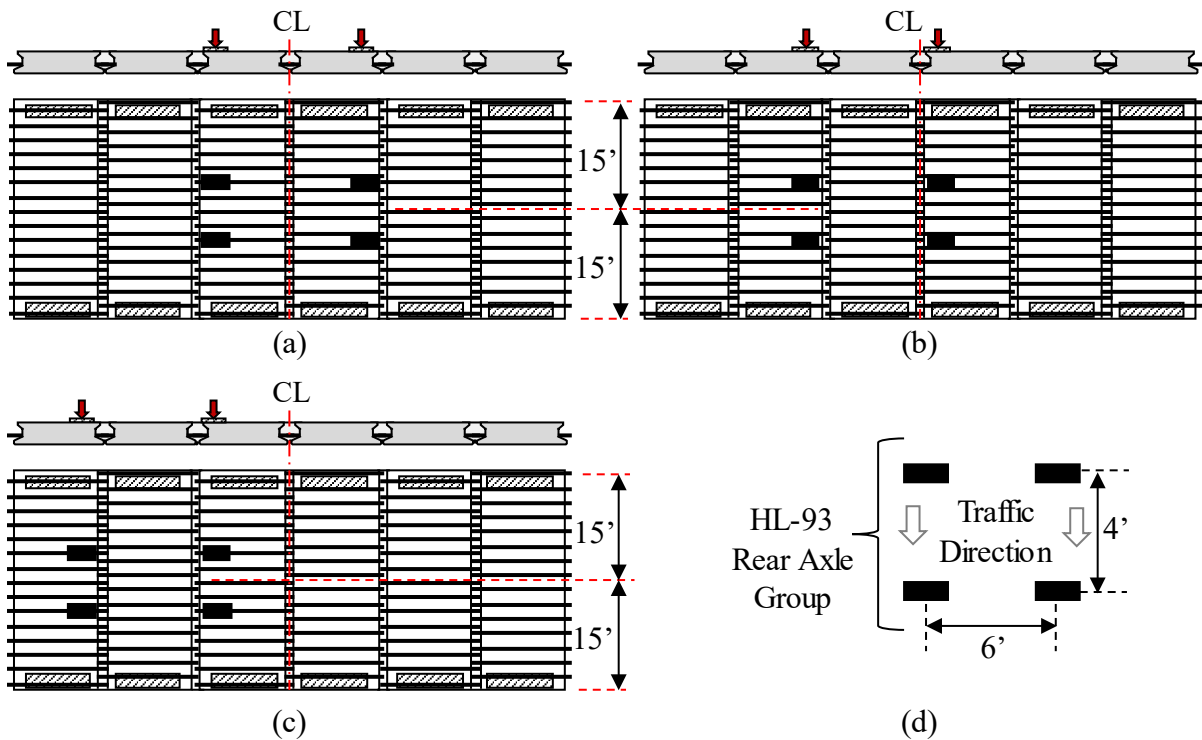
Midspan load locations (cross-section and plan view) in numerical model: (a) center, (b) off center, (c) outside lane, and (d) HL-93 rear axle group detail
